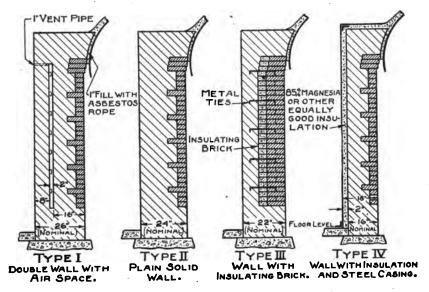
FIG. A. DIFFERENT TYPES OF CONSTRUCTION FOR SETTING WALLS.
